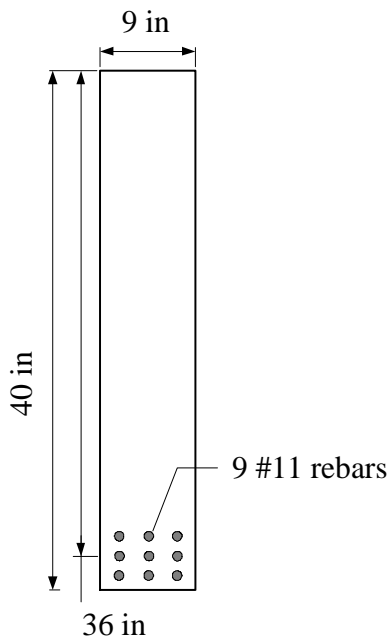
Section dimension and arrangement of longitudinal reinforcement steel rebars for section UHP/St60 40R-2
